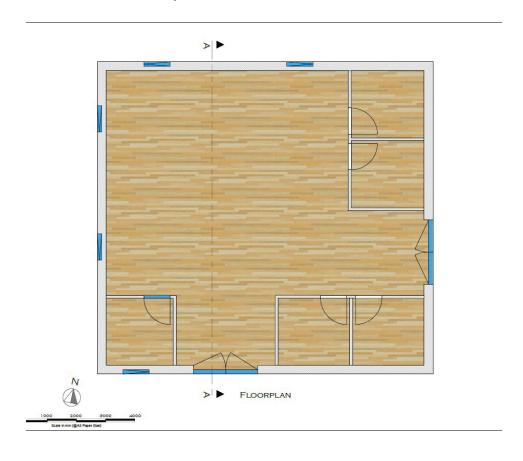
Proposed Floor Plan (please note – larger version of plan can be found in the Committee Plan Pack).
